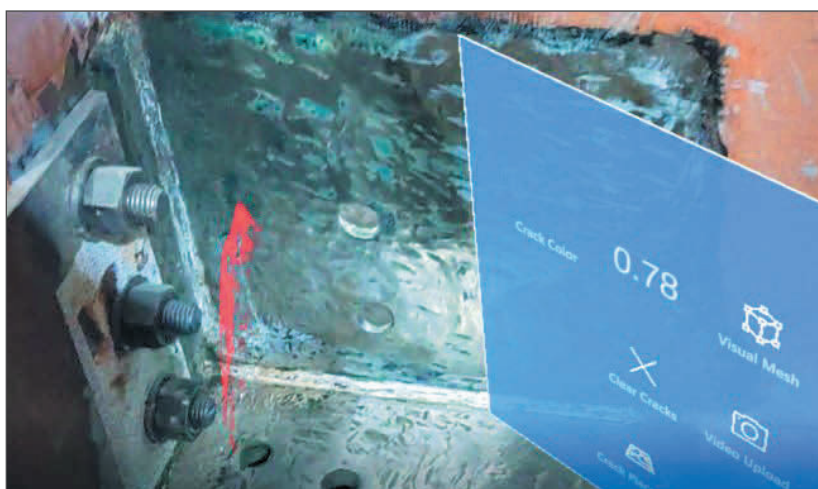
An augmented reality steel crack detection tool places a red mark—the virtual indicator—to show a crack's location in the steel structure's joint. The fatigue crack detection software also displays a virtual menu to facilitate field inspection.
